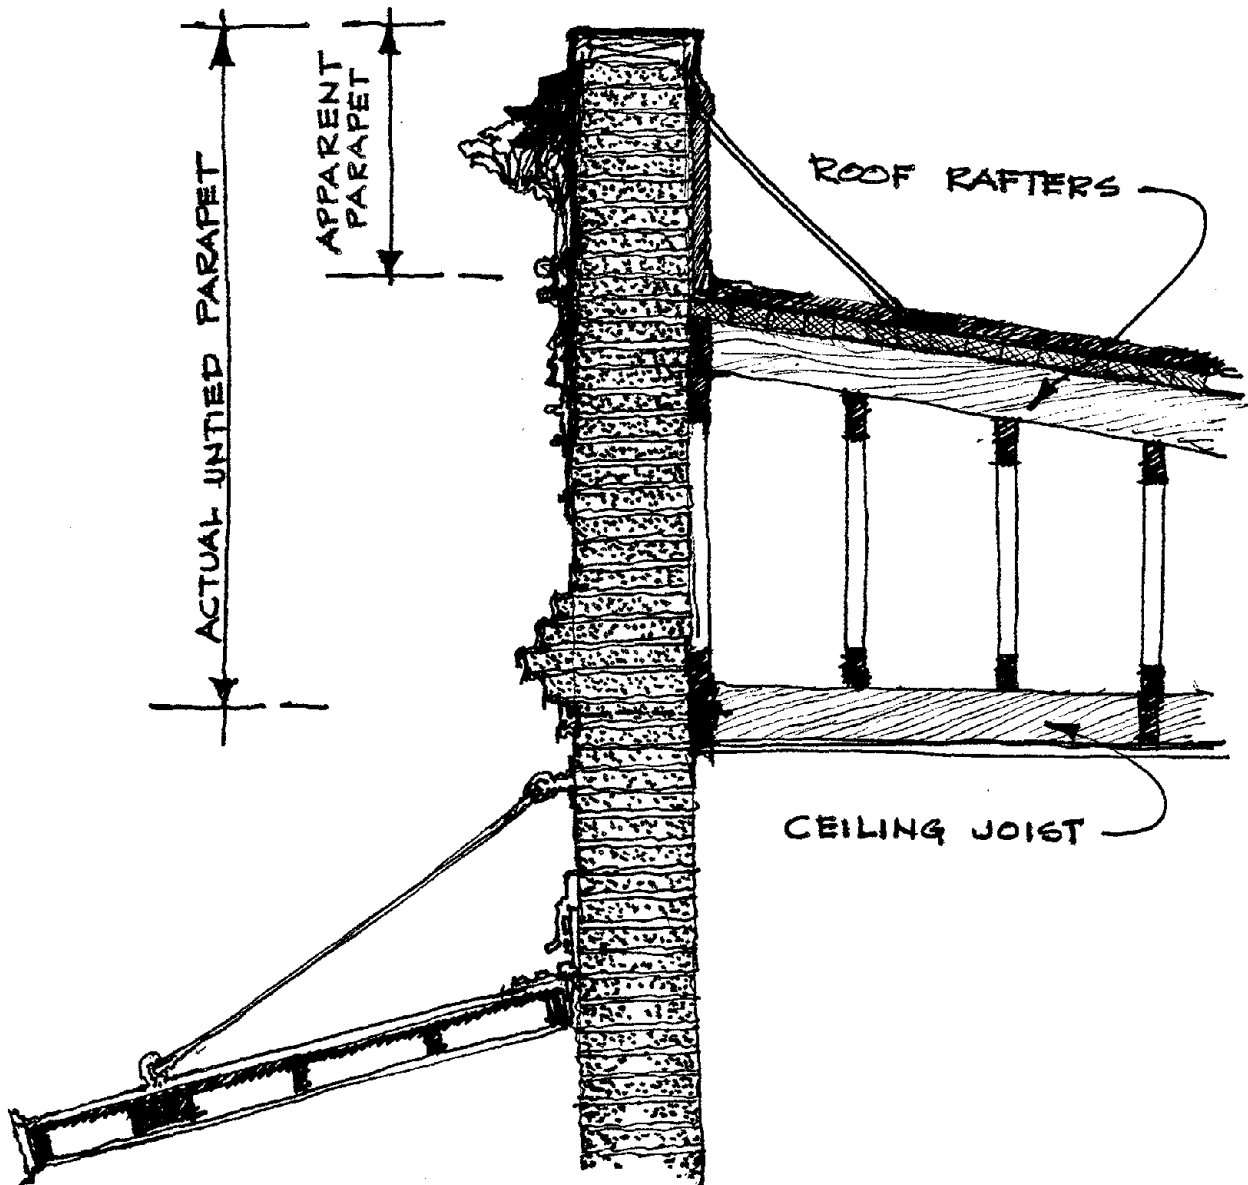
Section of typical parapet extending untied from the upper floor. The apparent parapet height is only to the rafters but in fact it extends in many cases 6 feet to the ceiling joists. In many cases the joists simply pocket into the brick and there is no tying of parapet to flooring
